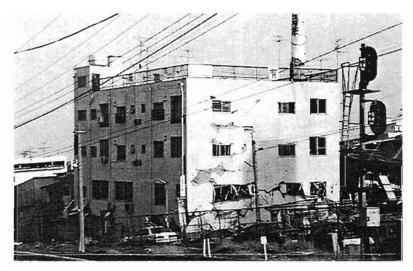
Local failure at long 1st floor window of building recessed into sloping site
